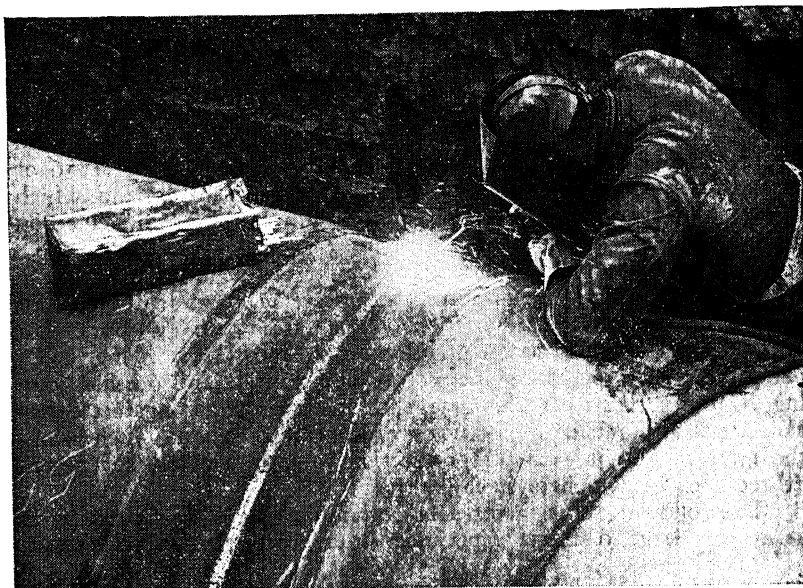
A 108-in. water supply line with butt welds reinforced by a steel band as shown. Girth seam is welded inside and outside.
